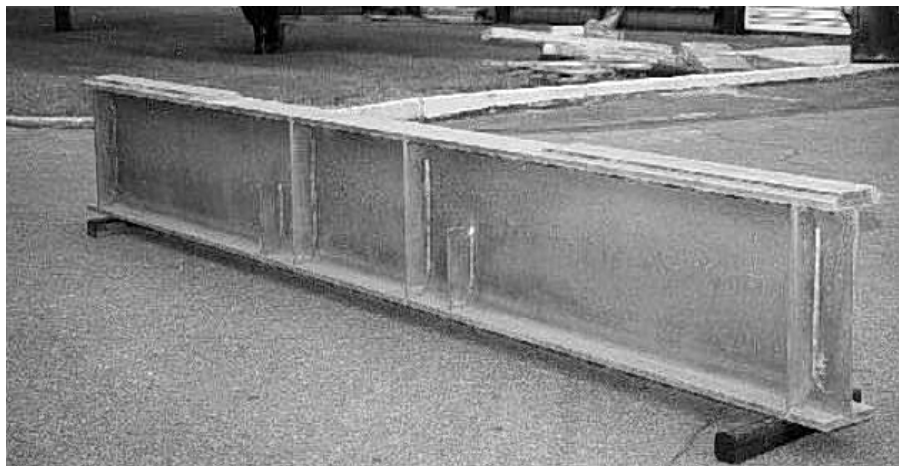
Rolled wide flange beam section with the transverse stiffeners and cover plates.
